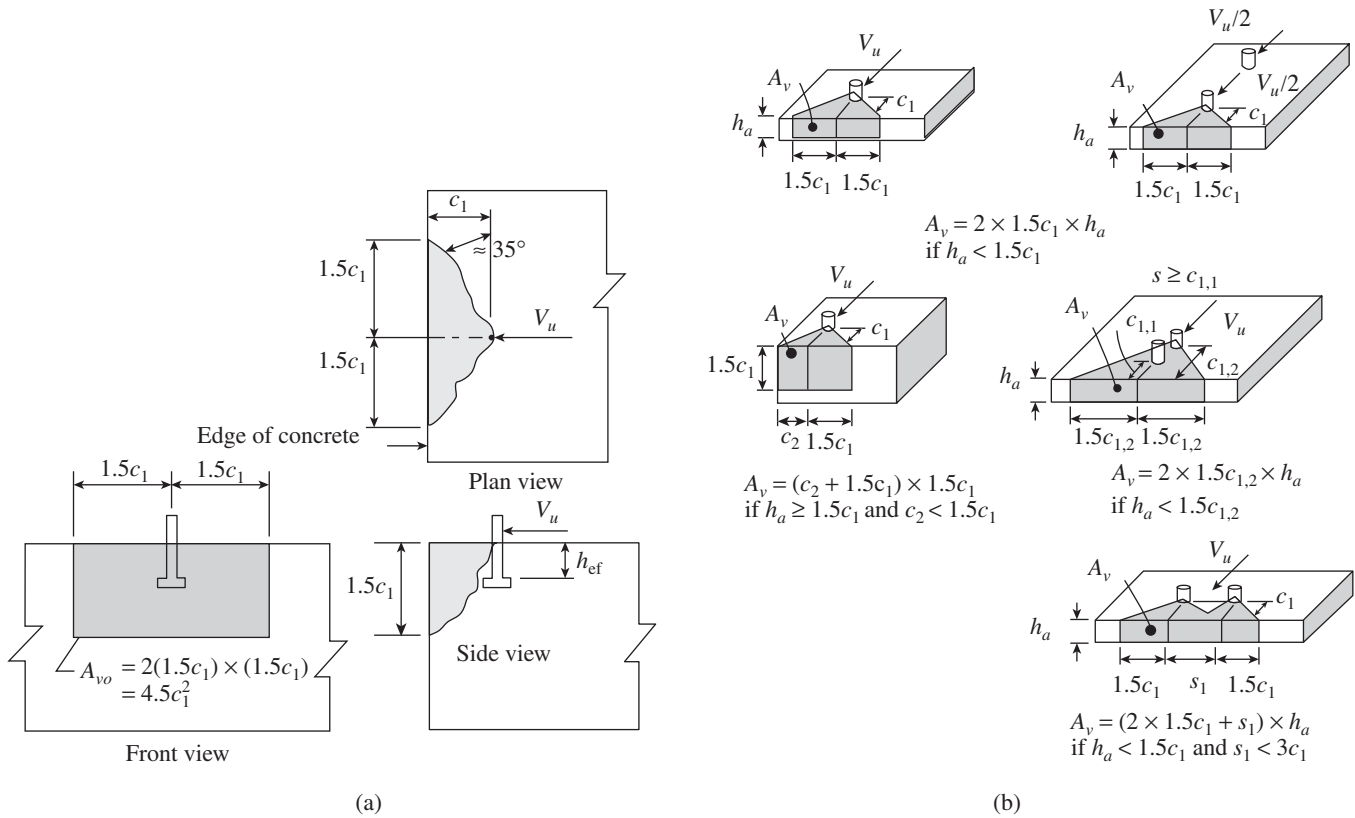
Projected area for single and group of anchors under shear loading (a) Single anchor (b) Group of anchors
